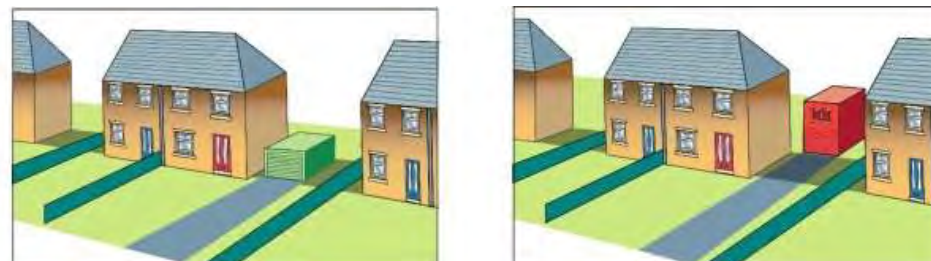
The left image shows an example of a suitable single storey outbuilding set back from the building line with suitable garden space retained. The right image shows an unsuitable outbuilding which is two-storey, set back too far from the building line and removes too much garden space.
